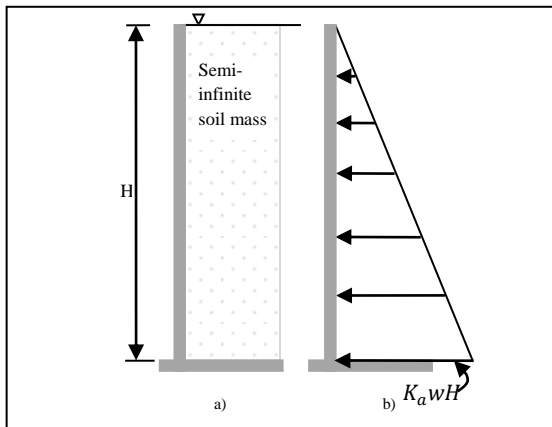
Stem of Cantilever type of retaining wall without shelf
